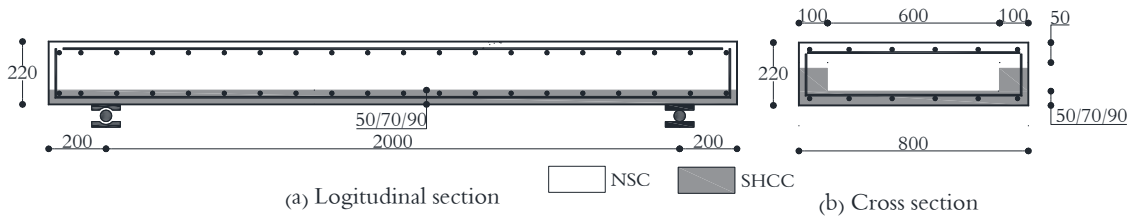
Concrete dimensions and reinforcement detailing of composite NSC-SHCC specimens.
